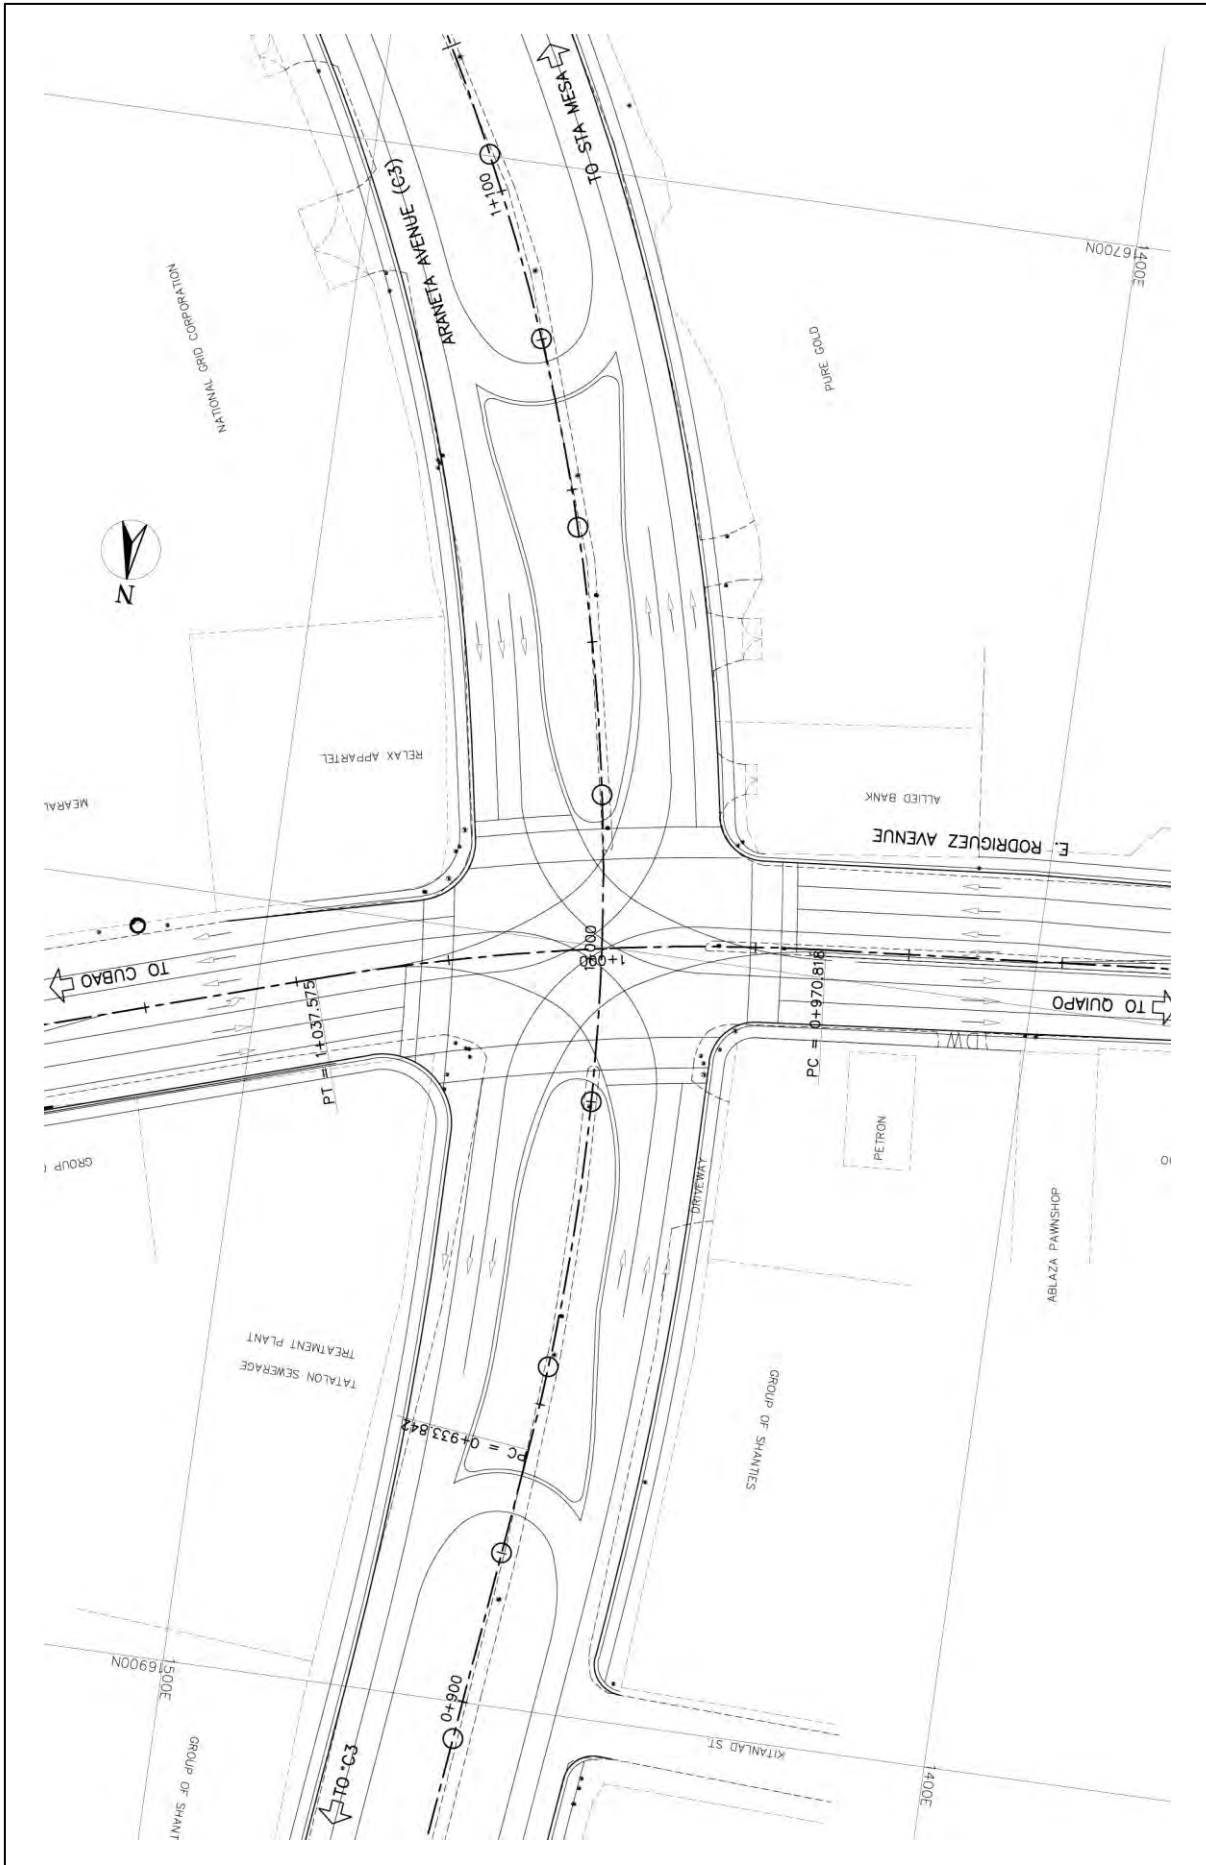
AT-Grade Intersection Plan (C-3/E. Rodriguez Interchange)
